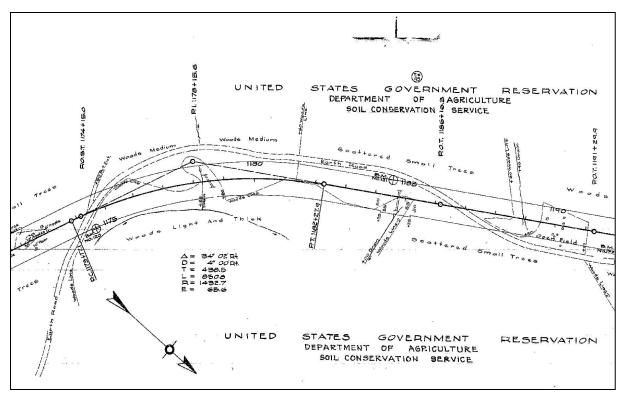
1948 Road Plans Showing Locations of the Dirt Road and (Now Existing) KY 109
